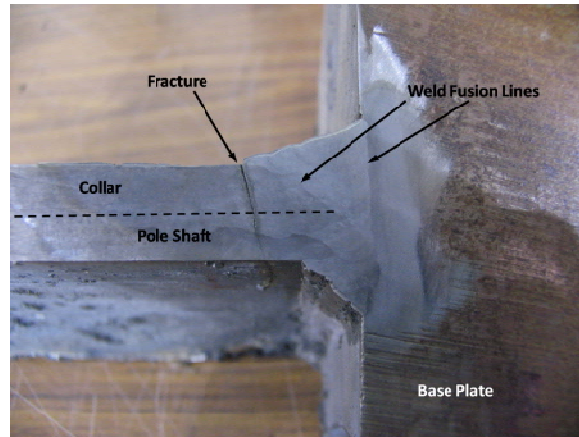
Cross Section of Full Penetration Weld of Sample with Collar (Stam, 2009)
